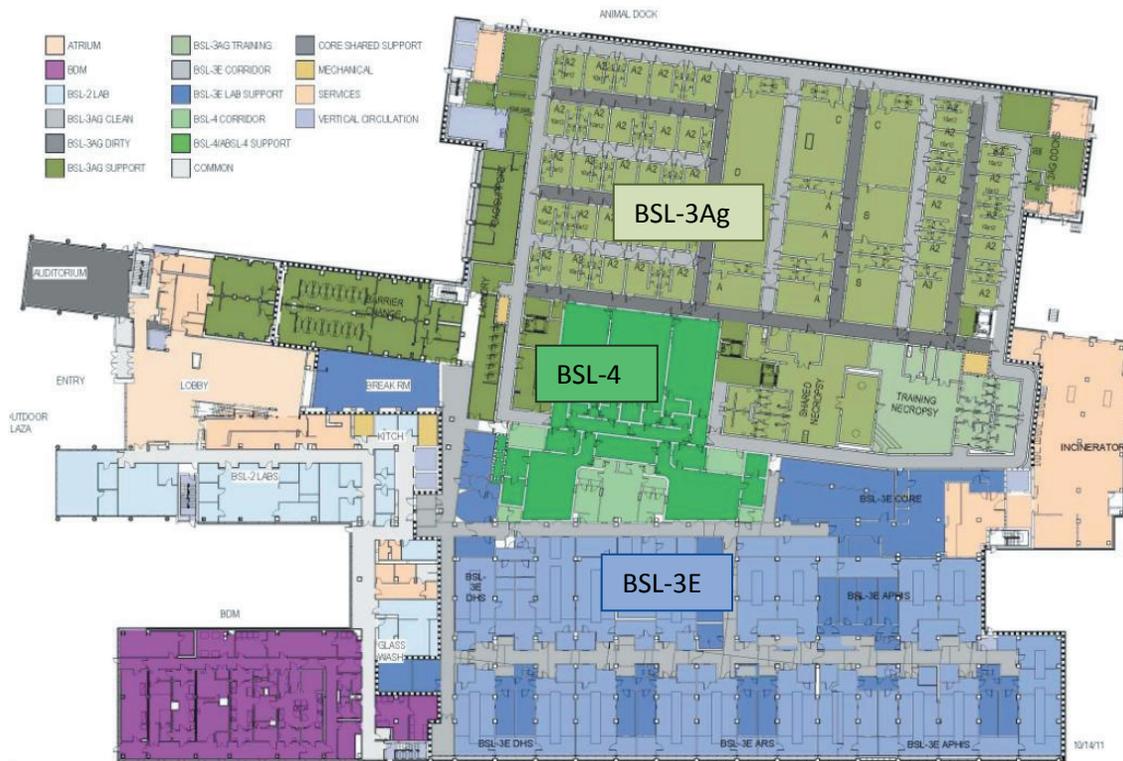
NBAF Main Building First Floor Plan [NDP, 2011]
